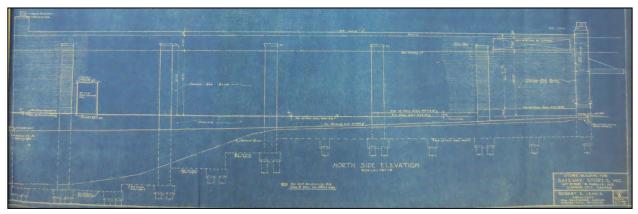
Original architectural drawings (side elevations) for a Safeway Store at 18th Street and Parallel Ave. in Kansas City, Kansas, that has the same standardized plan, local architect, and date of construction (1940) as Safeway No. 357.
